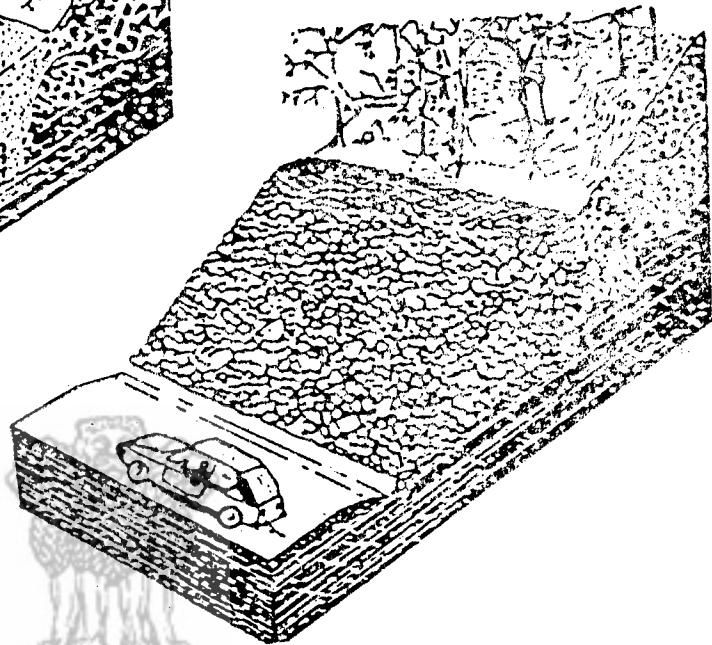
RETAINING WALLS WITH EMPTY BITUMEN DRUMS.
